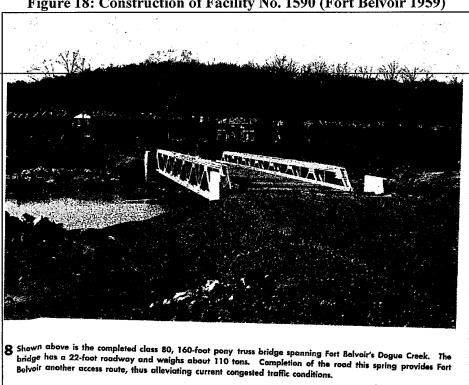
Construction of Facility No. 1590 (Fort Belvoir 1959)
